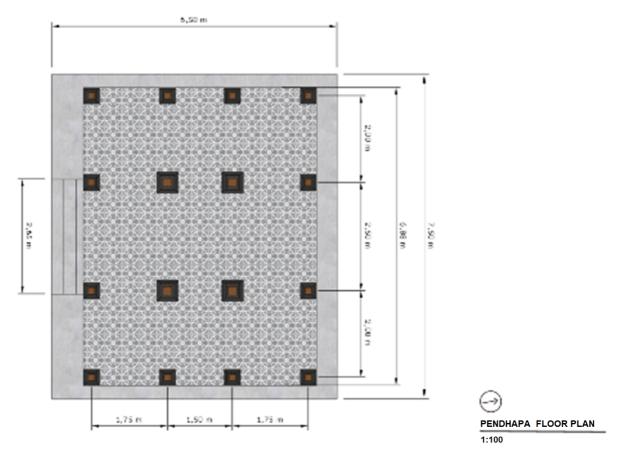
Pendhapa floor plan (source: studio, 2023)
